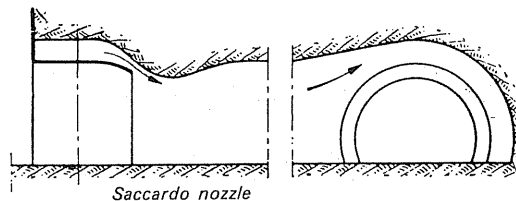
Longitudinal section and cross-section of a Saccardo nozzle at a tunnel entry.
